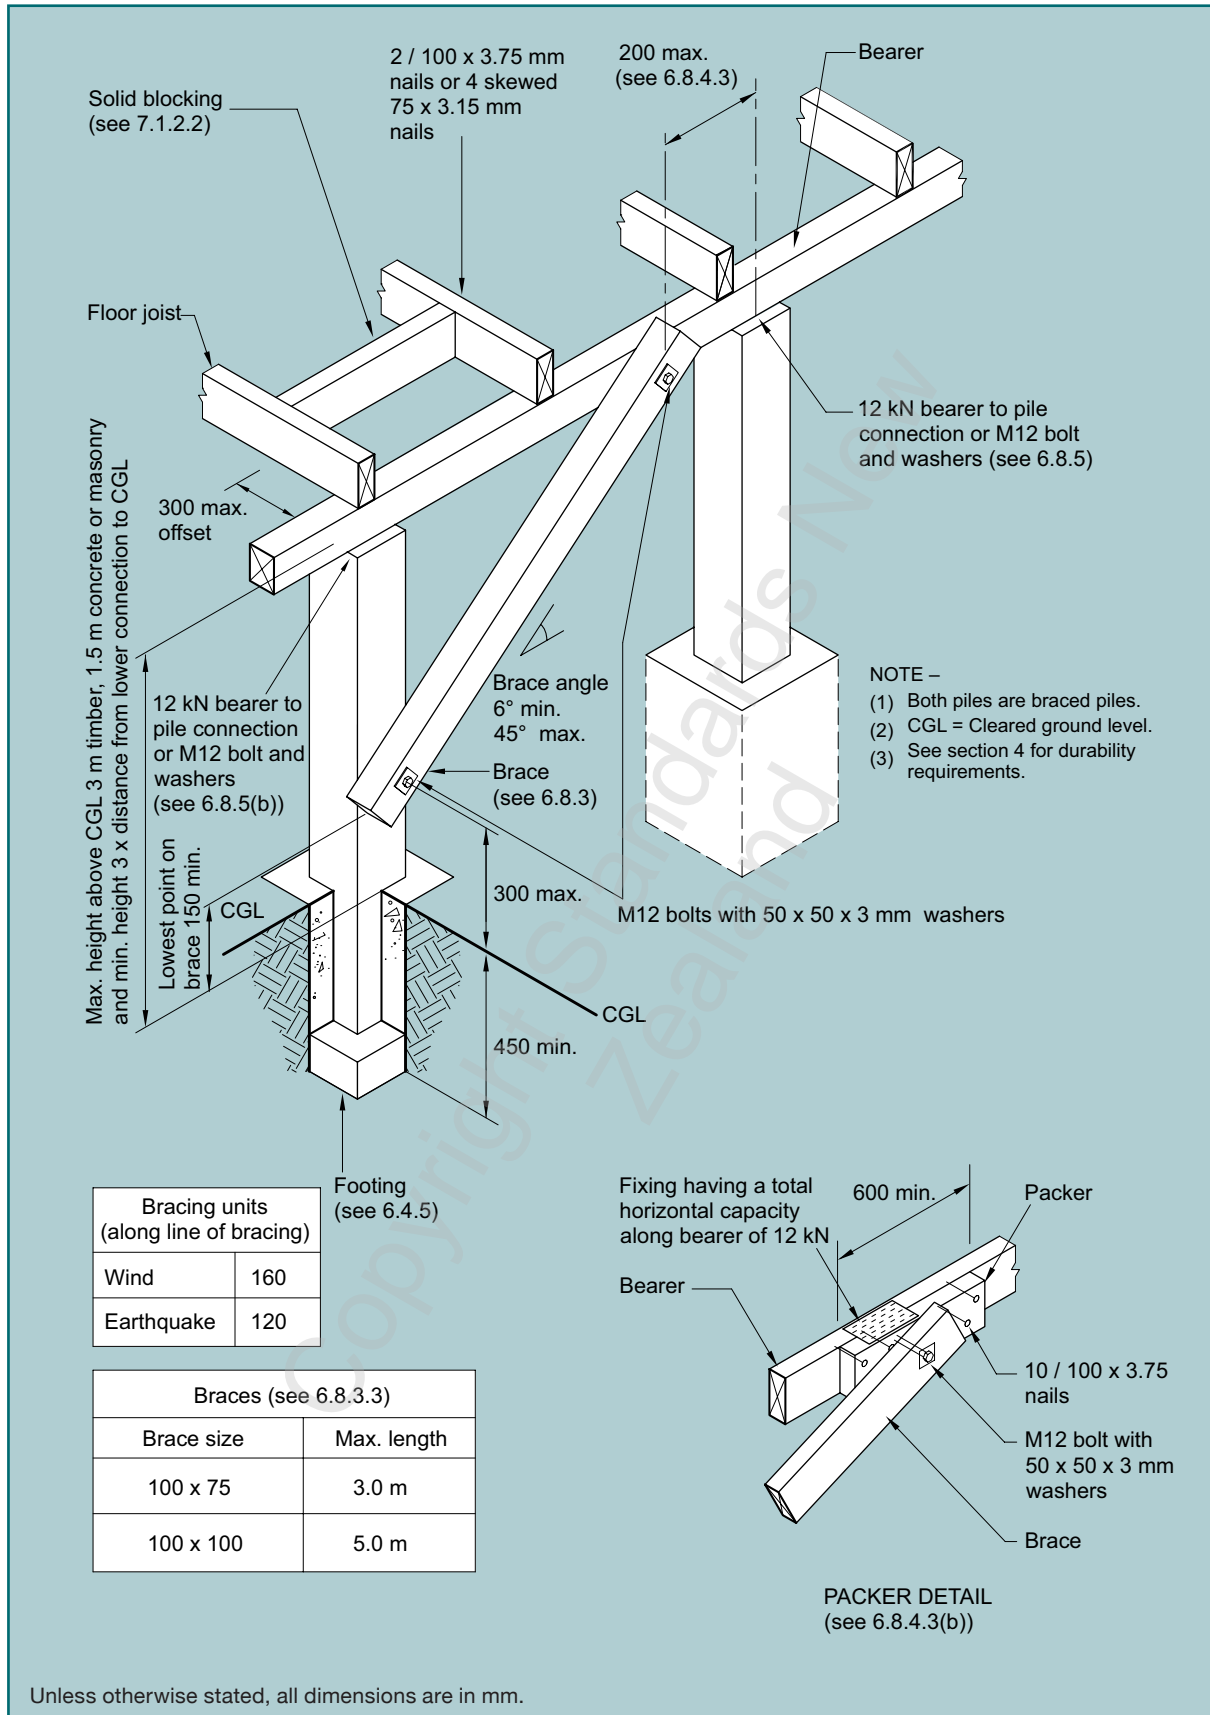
Braced pile system – Brace connected to bearer (see 6.8)
